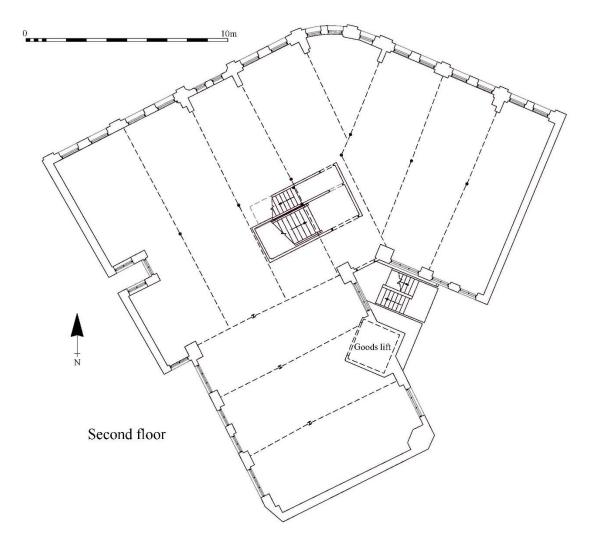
Second floor plan Modified from drawing supplied by client. Note difference in stair width
